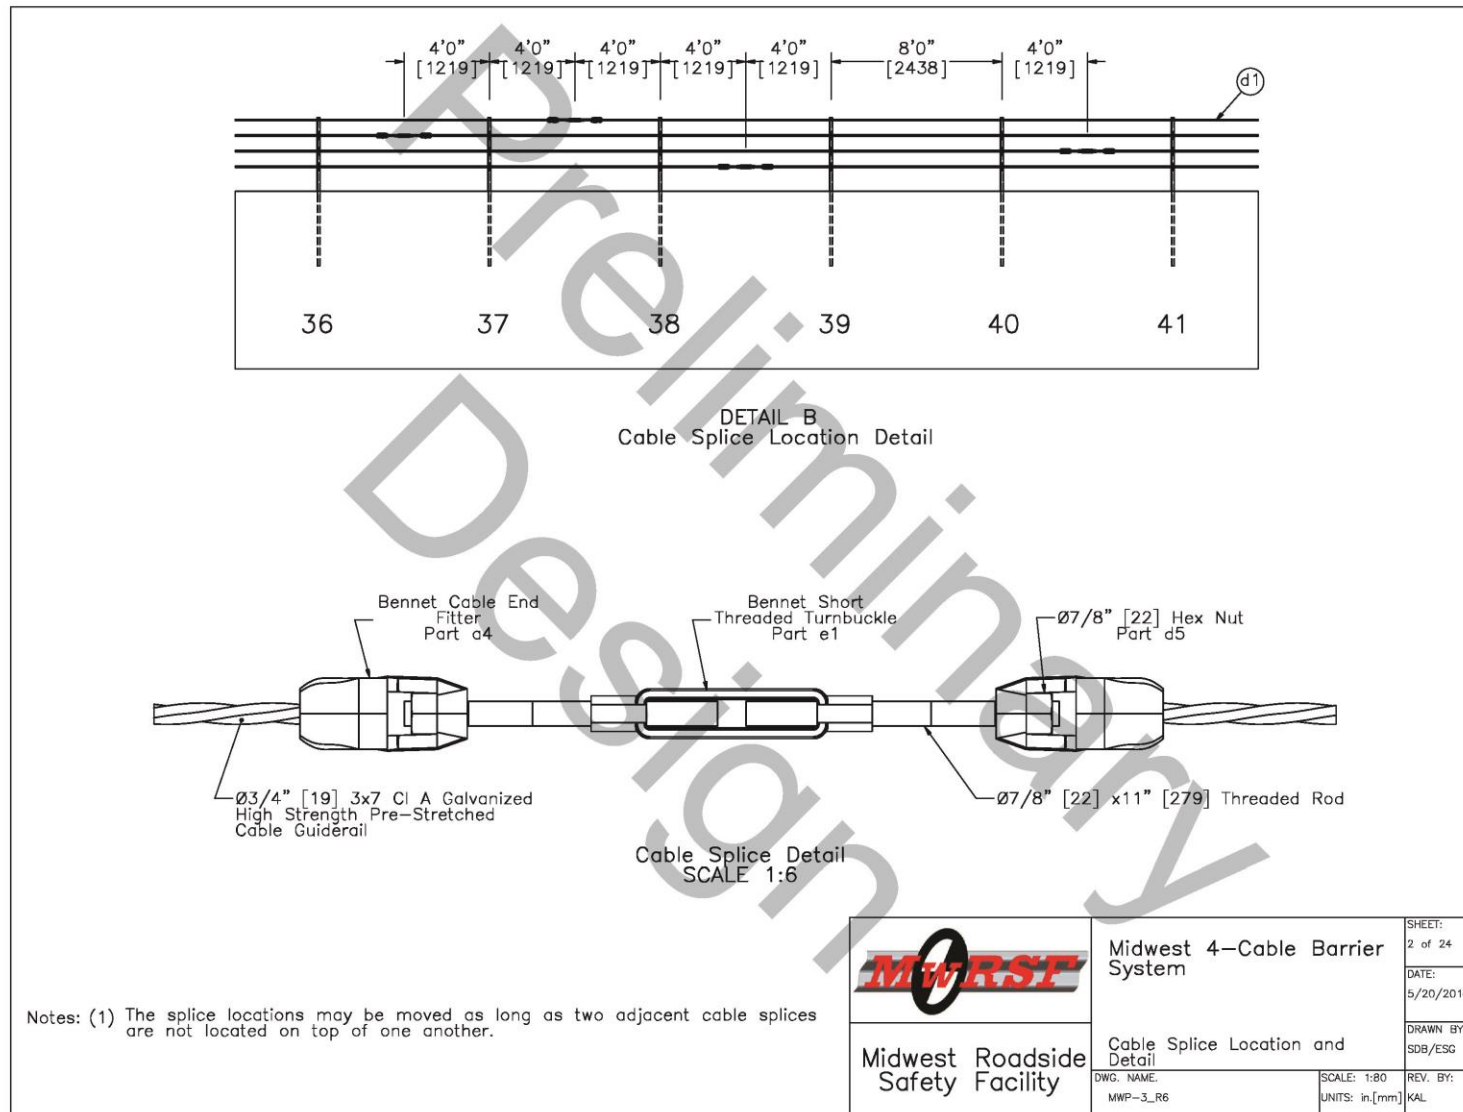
Cable Splice Location and Detail, Test No. MWP-3
